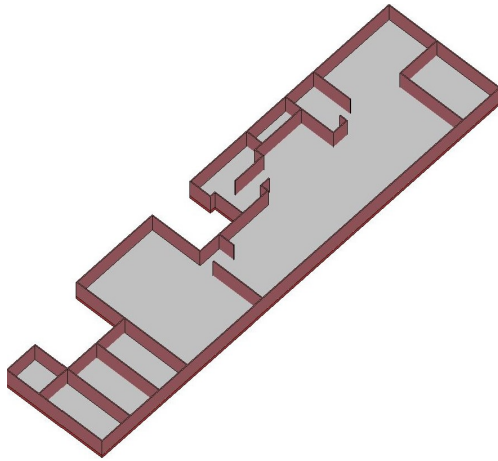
Reconstructed Wall Structures Figure 5: Reconstructed Openings in the BIM Model
